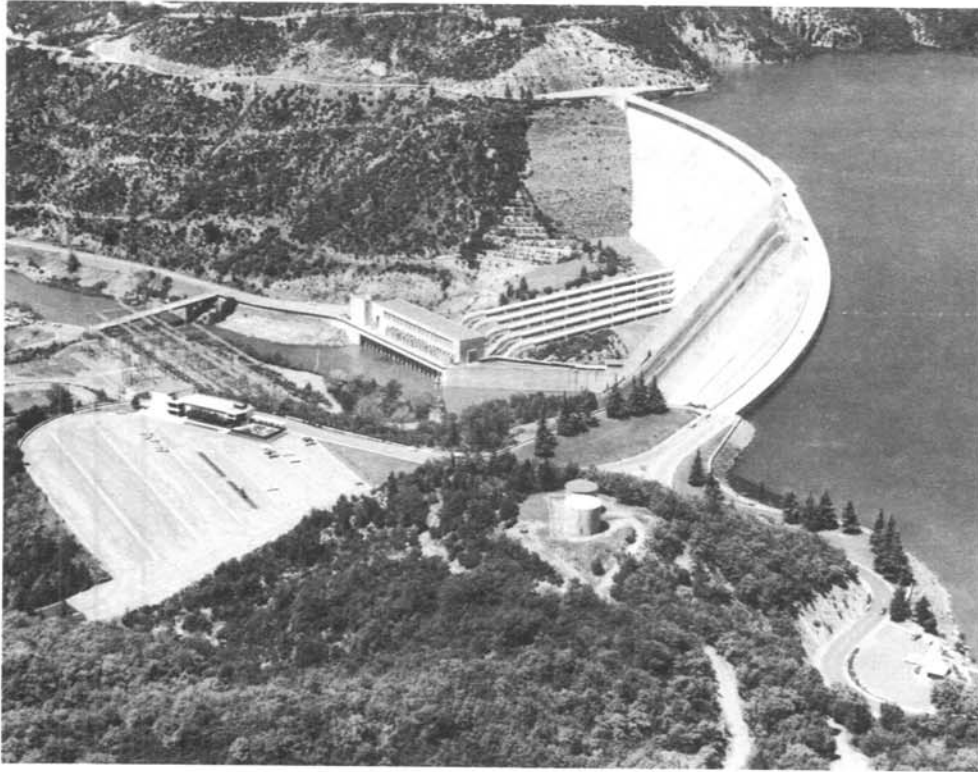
Aerial view showing profile of Shasta Dam on Sacramento River - 5/7/75
